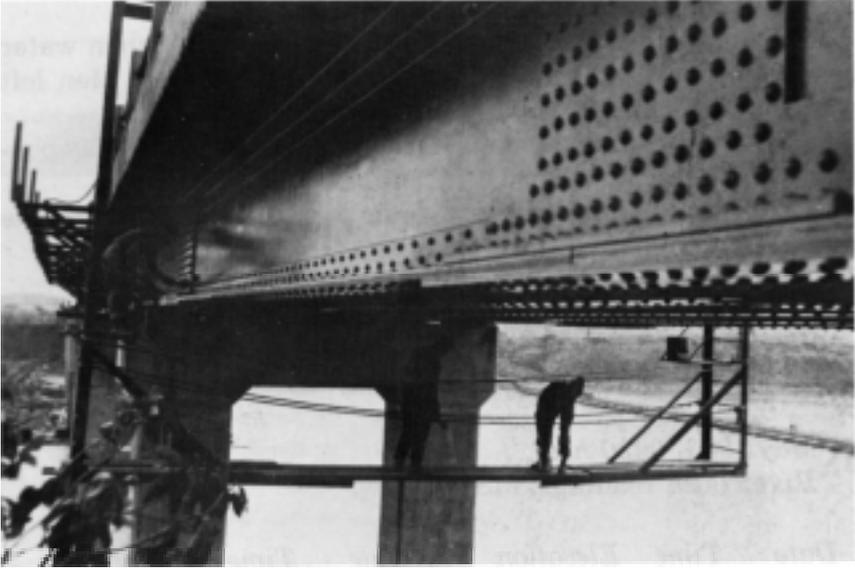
“Jackson’s chariot,” which could be rolled from the deck, providing scaffolding for bridge painters.
